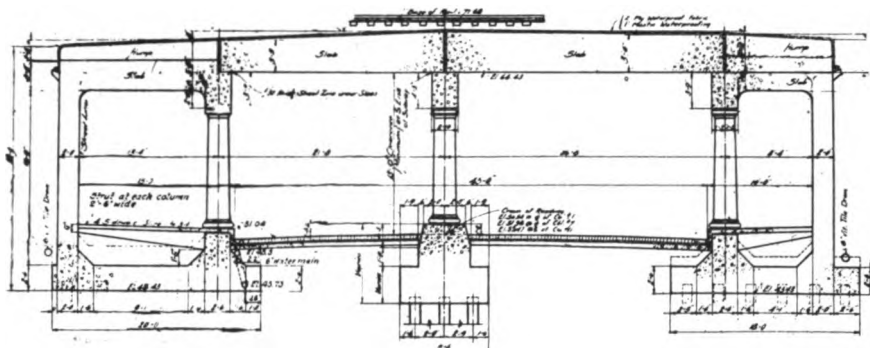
DRAINAGE IS CARRIED TO TILING ON THE ABUTMENTS OF SUBWAYS.
